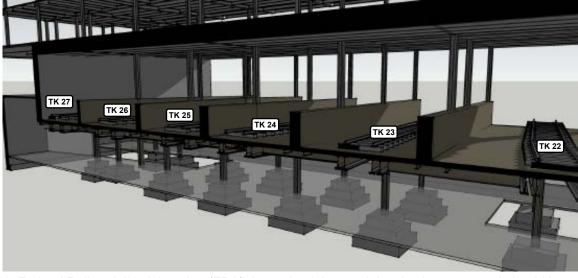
Existing 1st Street Tunnel and subbasement configuration (looking south)
